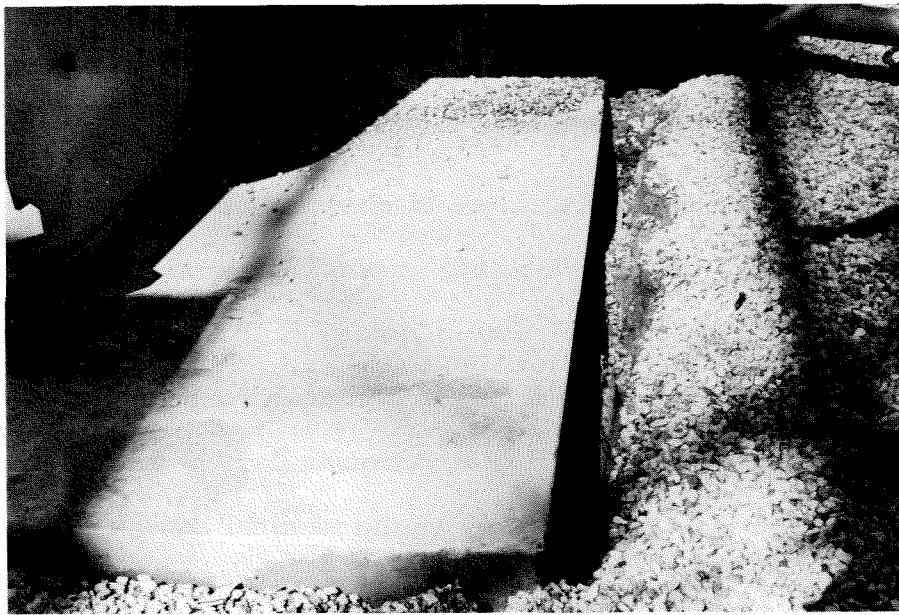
Valve transformer footing, showing evidence of footing movement. Sylmar Converter Station.
